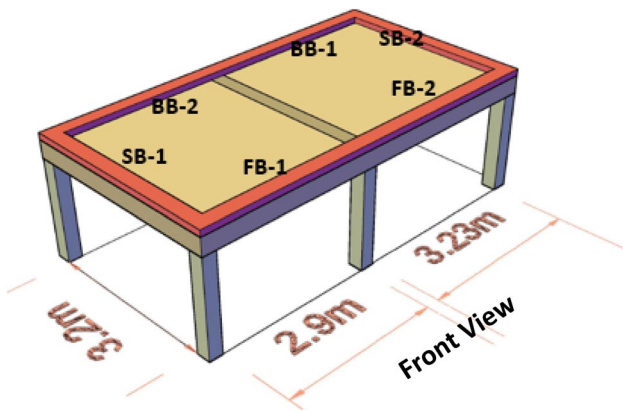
Auto-CAD sketch of car parking showing the designation to beams
